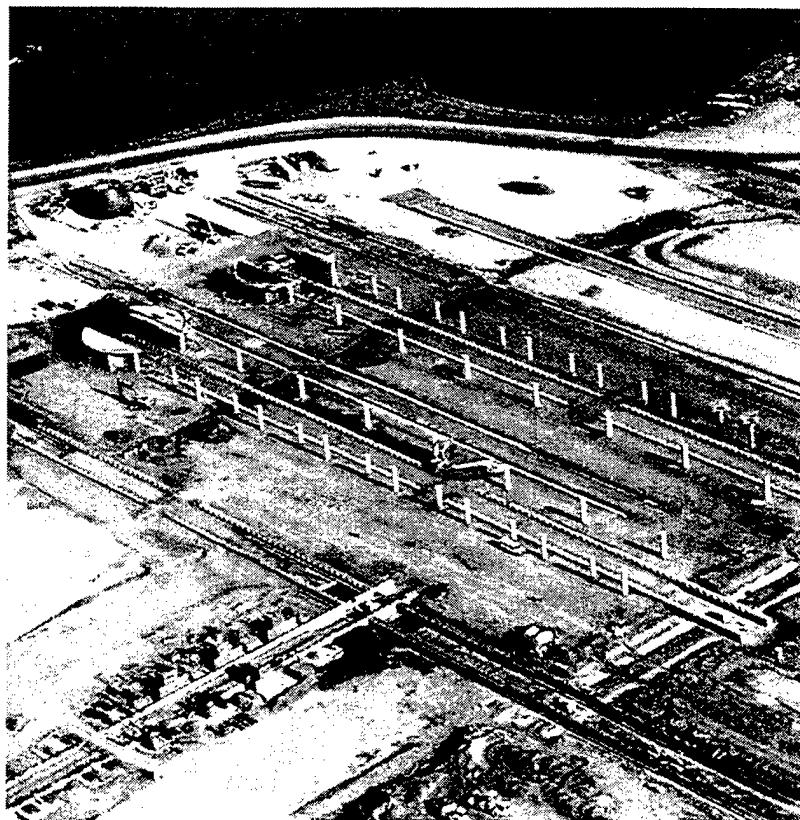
Initial Stage of the Precast Yard – Concrete Pillars and Skidways
